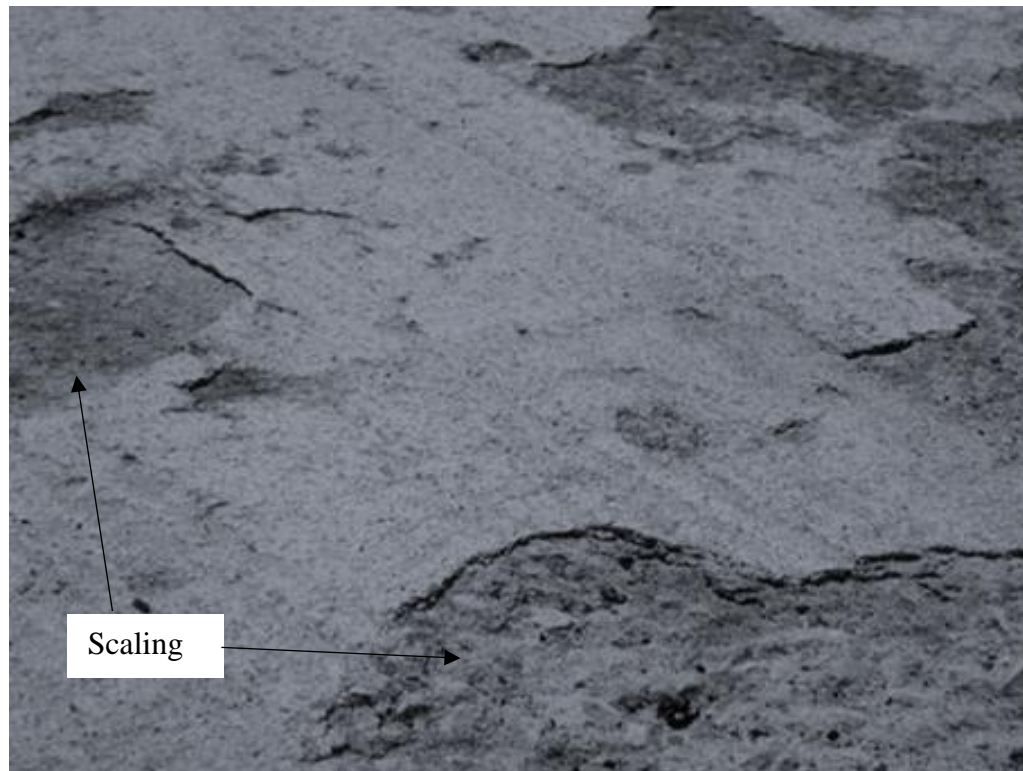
Bridge deck deterioration shows concrete scaling.
